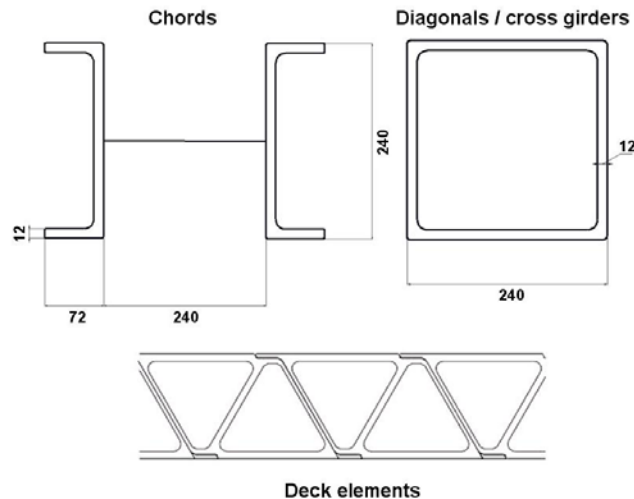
Structural profiles proposed for GFRP lightweight bridge model
